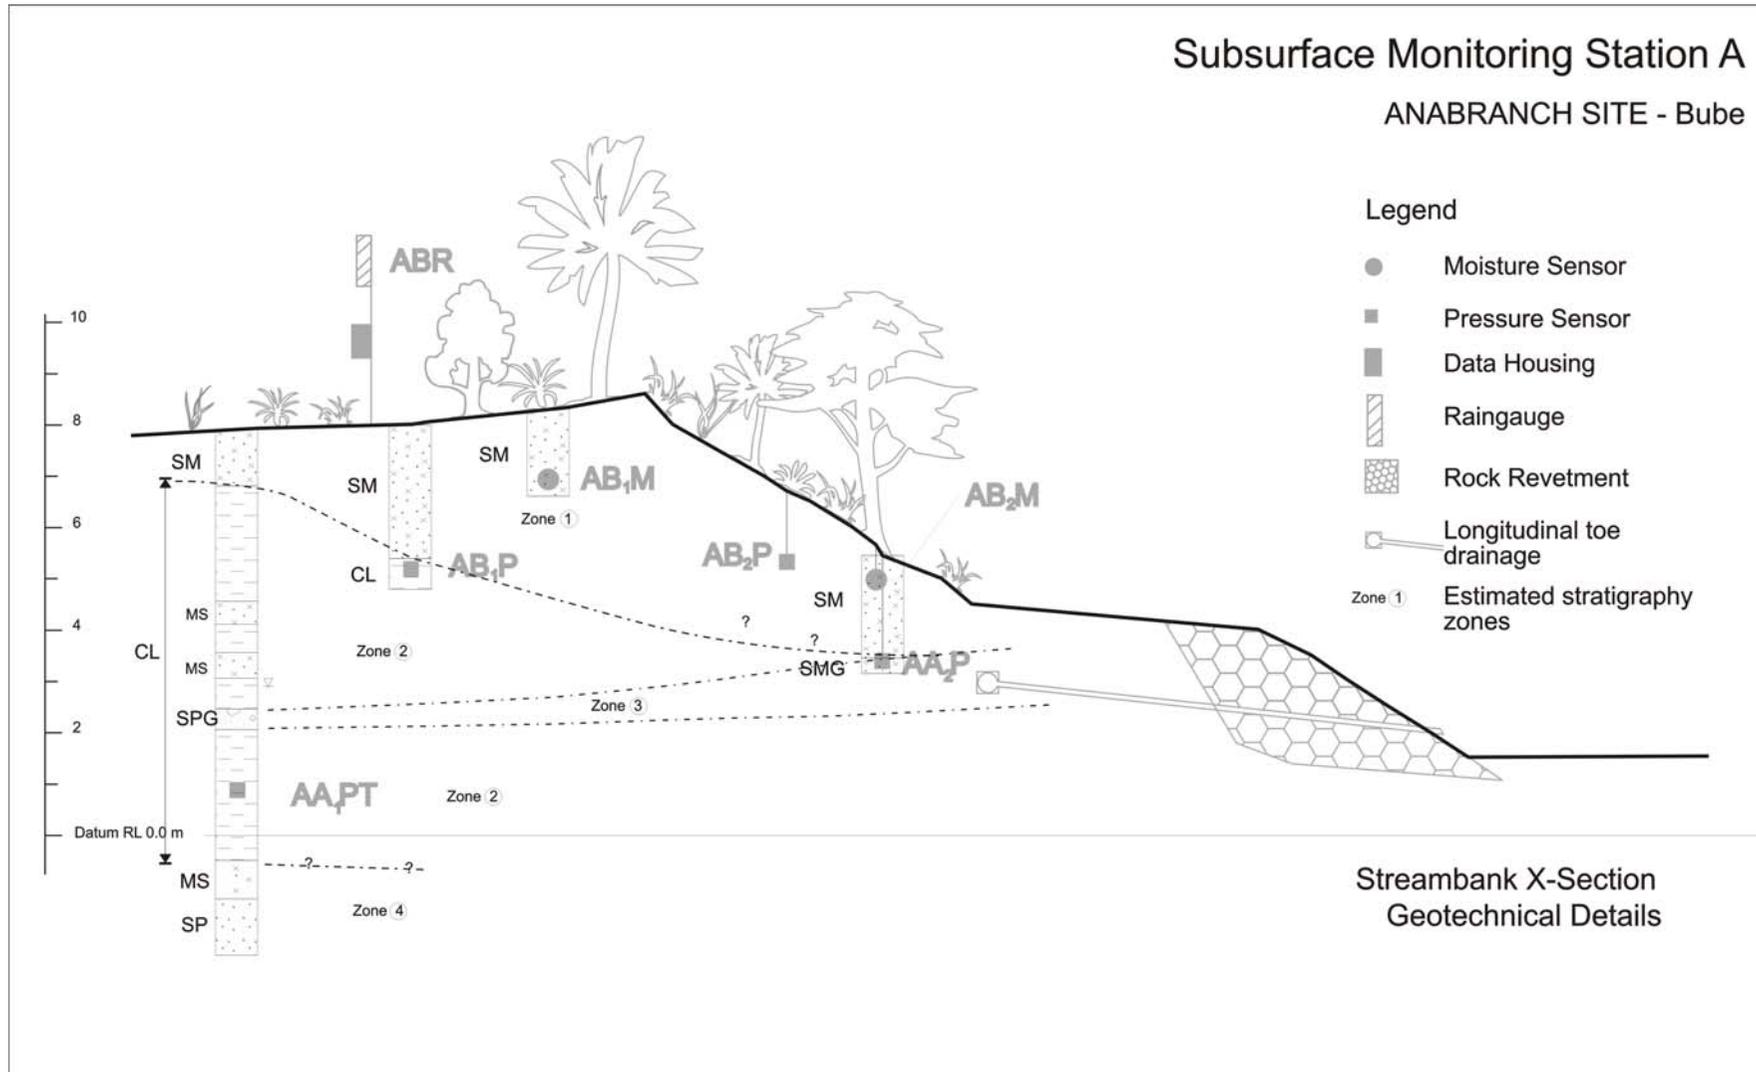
Anabranche Bube Subsurface Monitoring Station A - geotechnical streambank cross-section.
